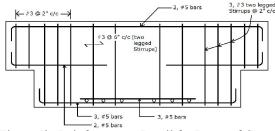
Reinforcement Detail for Beam of Group G-1 (18" x 9")
